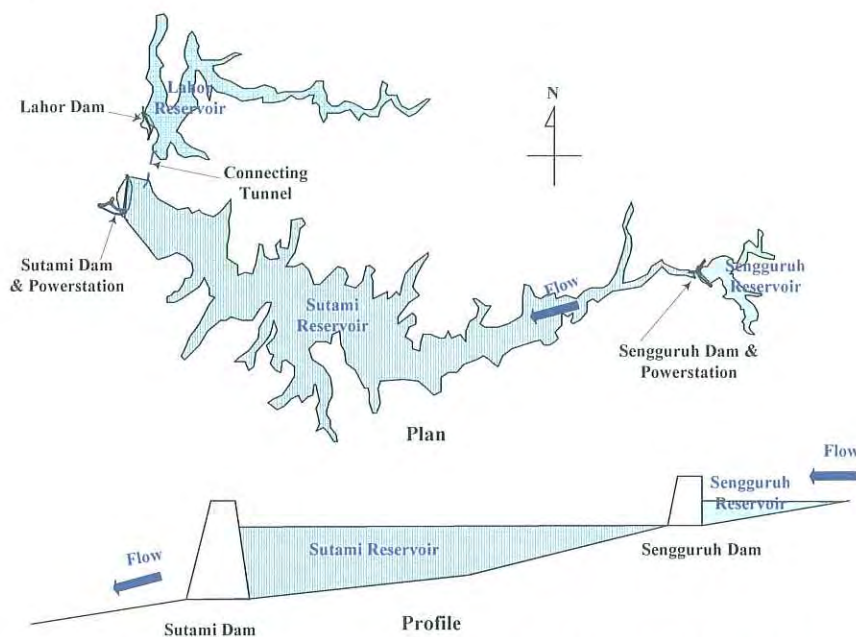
Layout Plan and Profile of Sutami and Sengguruh Power Station
